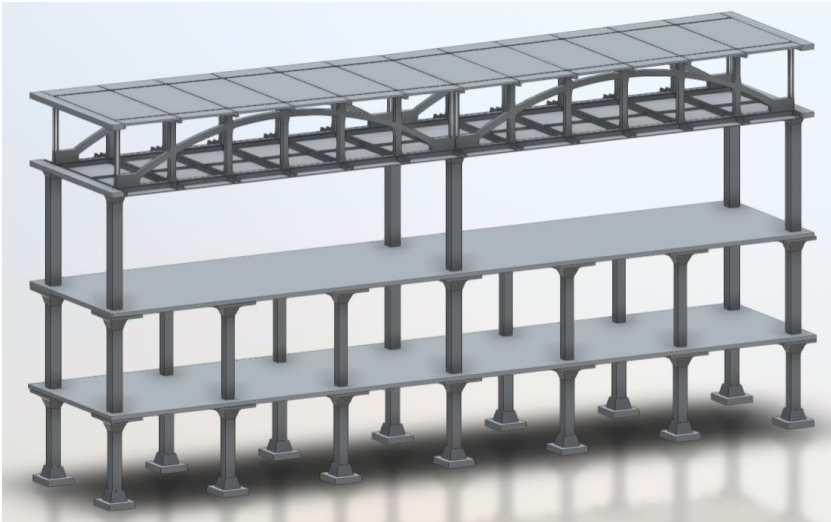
Structural scheme of sections and frames characterizing the mechanical strength and stability of the building in 3D version.
